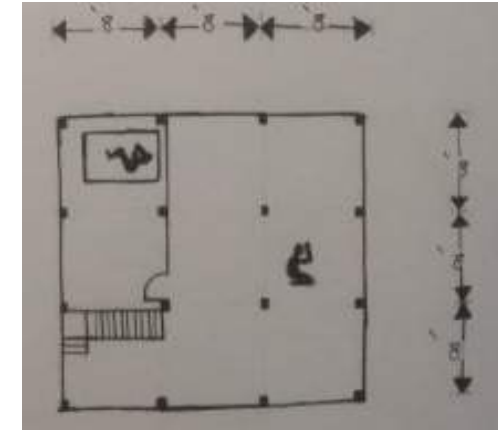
Sample Floor Plans of Myanmar Traditional Houses
